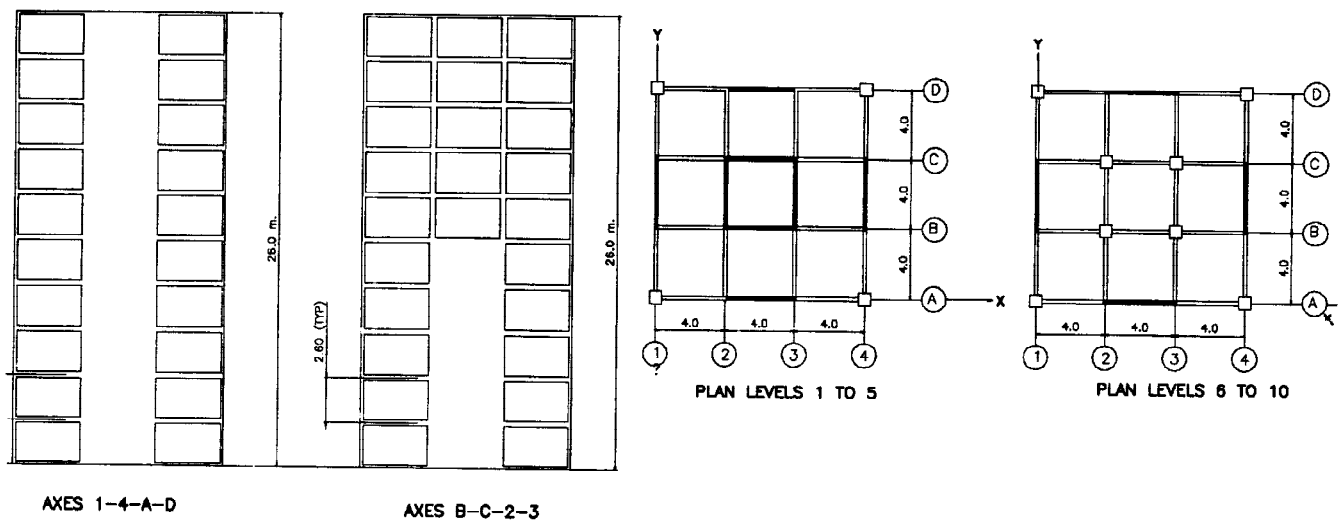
Building 1: Ten story building with walls interrupted in height.
